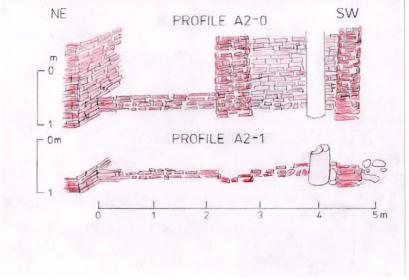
Present profile A2-1 (see fig. 1) of North wall at the entrance leading into the byzantine church (left part of drawing) seen from the church. A2-0 - reconstruction. Entrance into the B.CH. seen from church.
